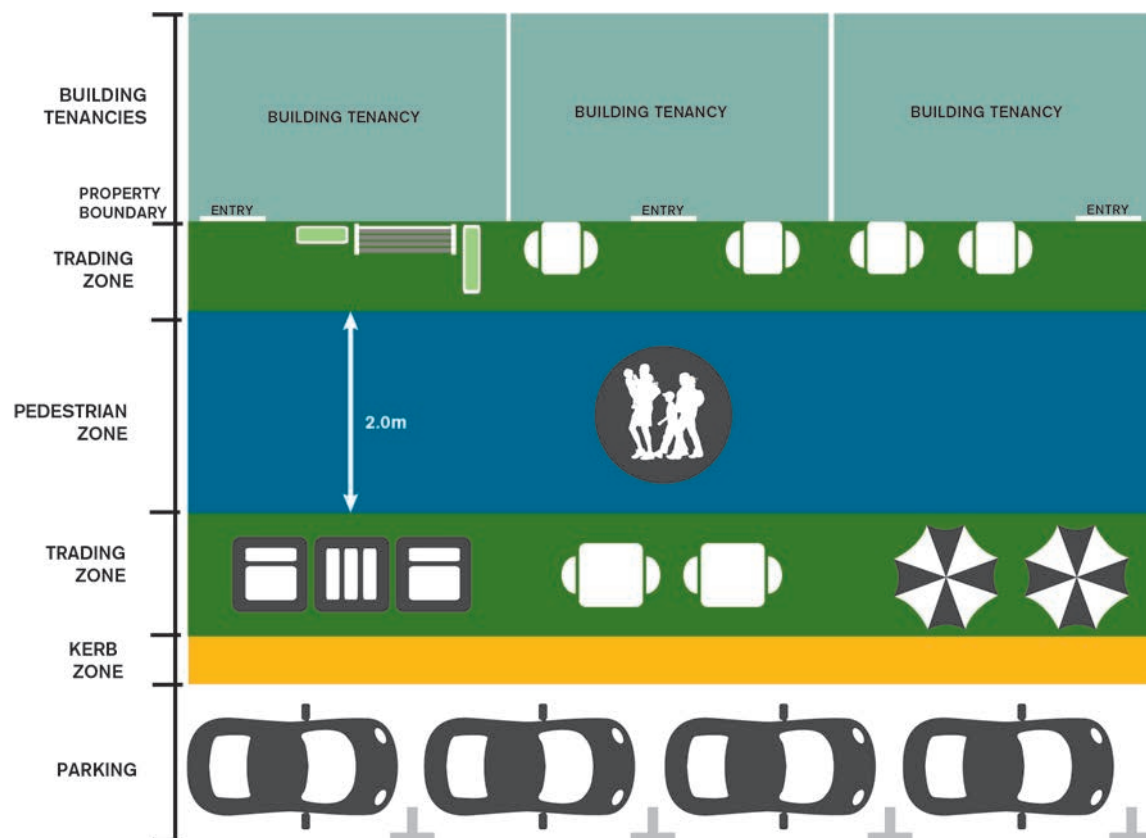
Alternative footpath zones arrangement - split Trading Zones with the Pedestrian Zone in the centre of the footpath area
